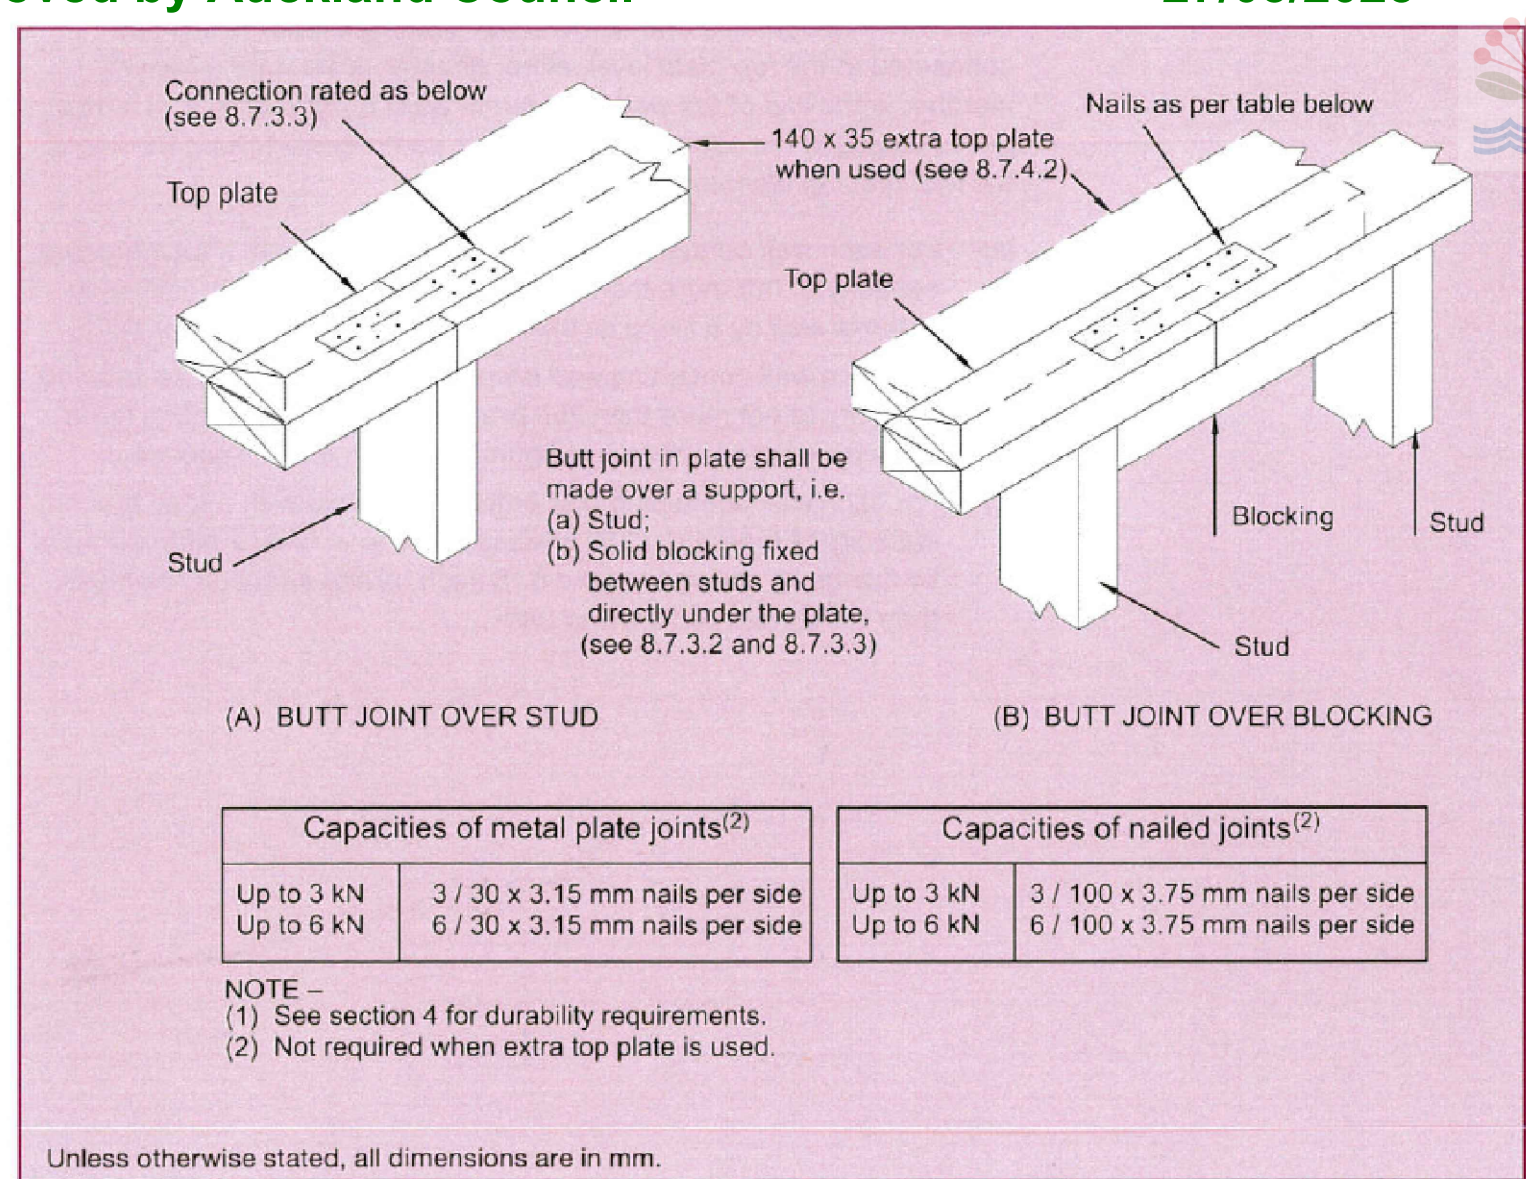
Connecting top plates in line – Walls containing bracing (see 8.7.3.3)
